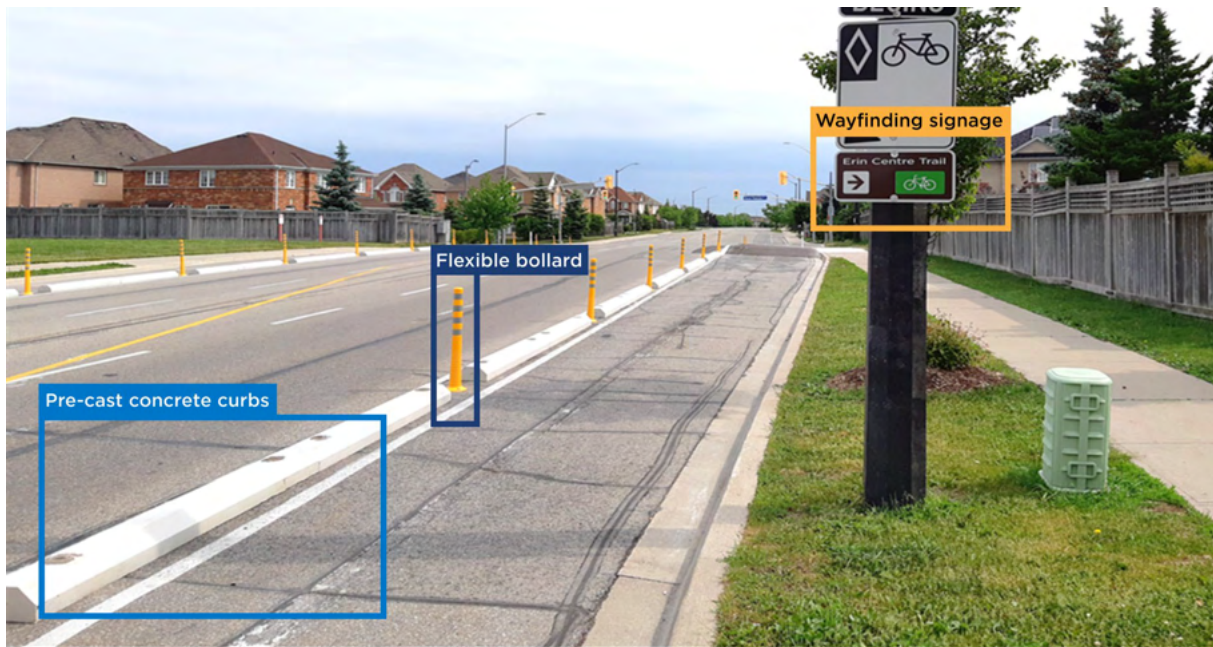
Example of protected bike lanes implemented as a quick-build cycling project on Erin Centre Boulevard.
